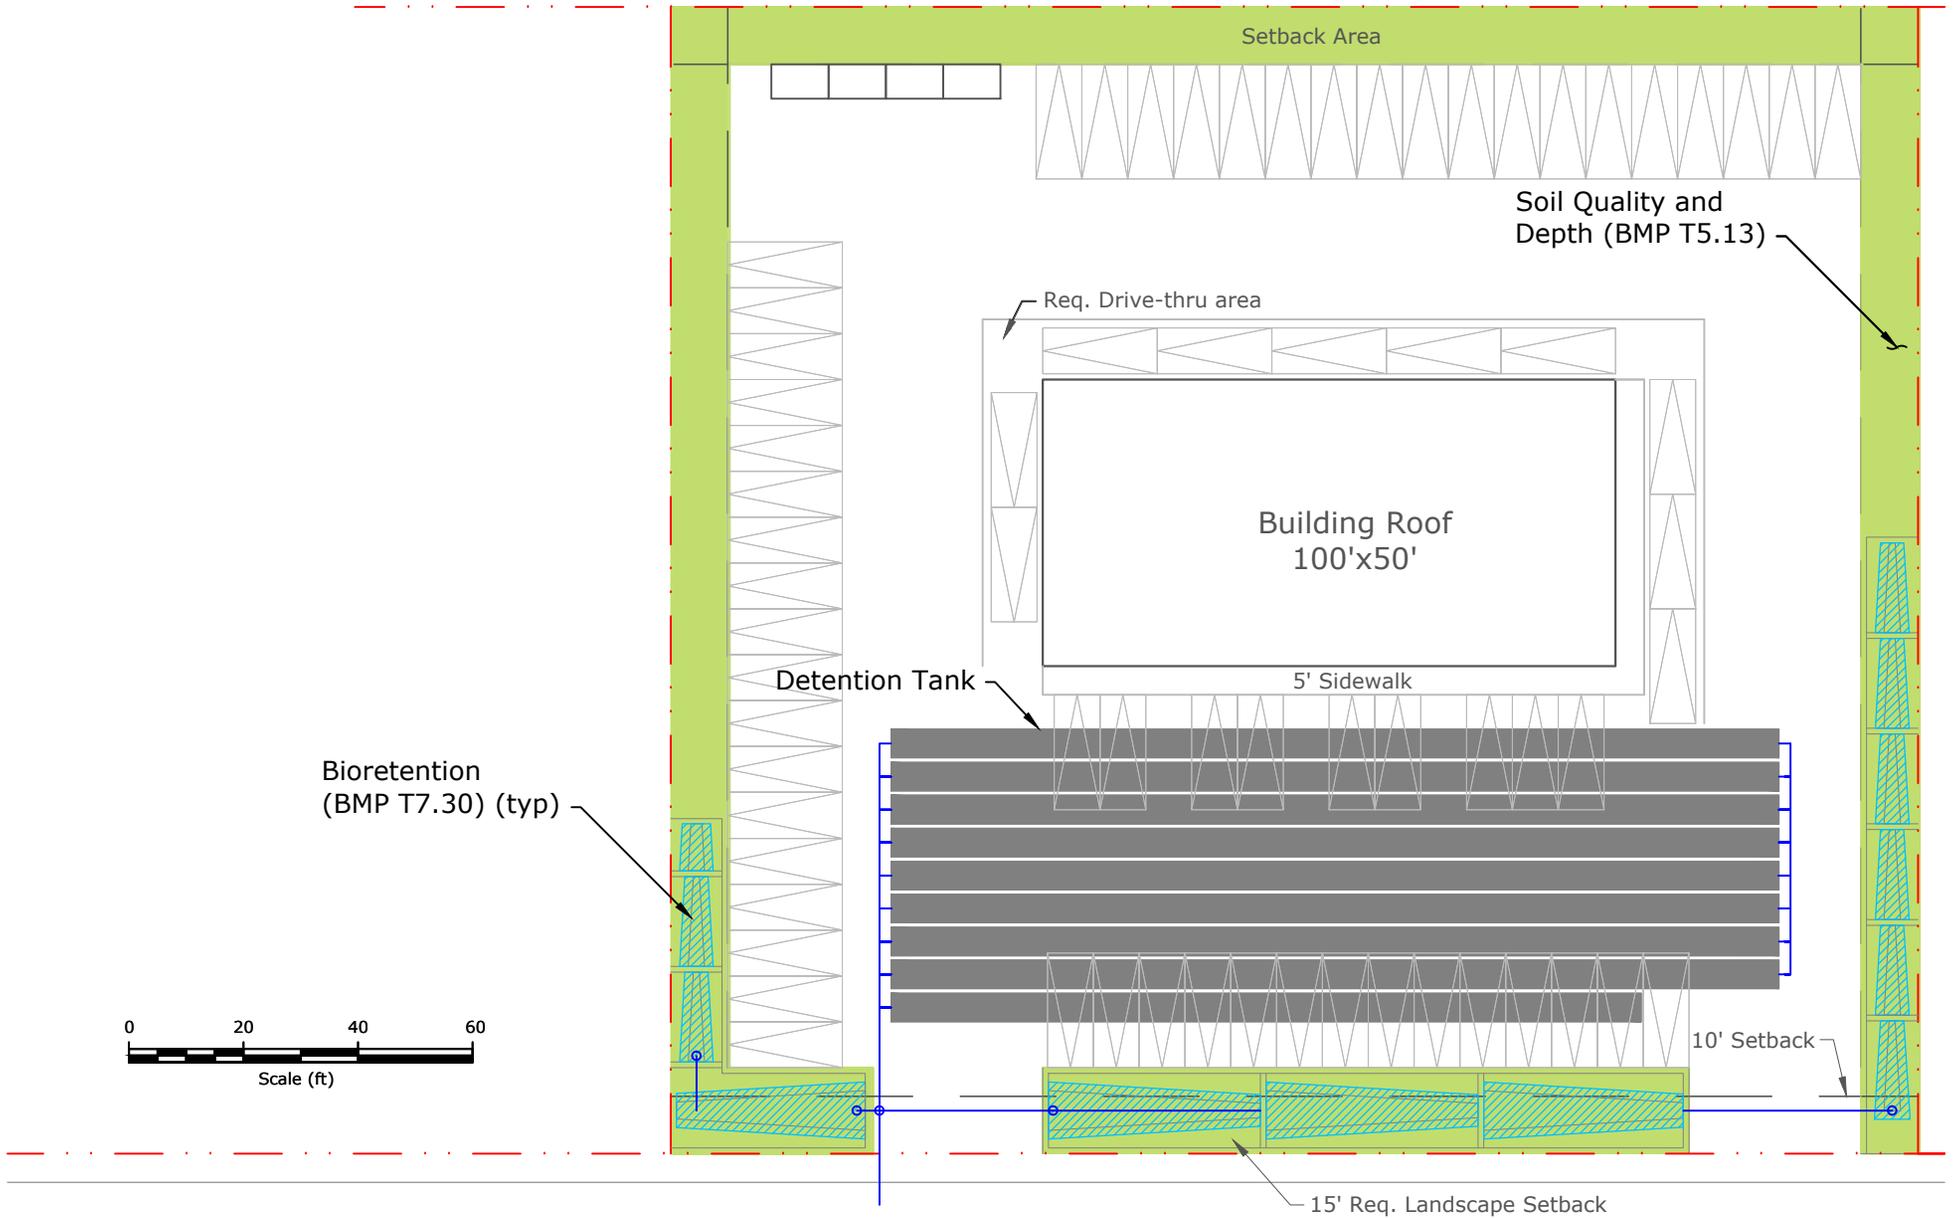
Scenario 10. Permanent Stormwater Site Plan – Small Commercial Development, 2012 Requirements, Till Soils
